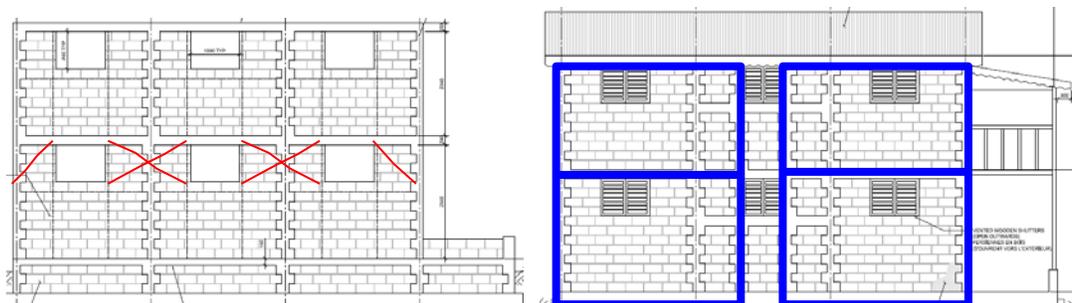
Window openings in series without tie columns may result in cracking of the unconfined piers created by the openings. Placing tie columns at every other window in series allows subdivision of walls into individual shear walls (with a maximum of one opening) bounded by confining elements
